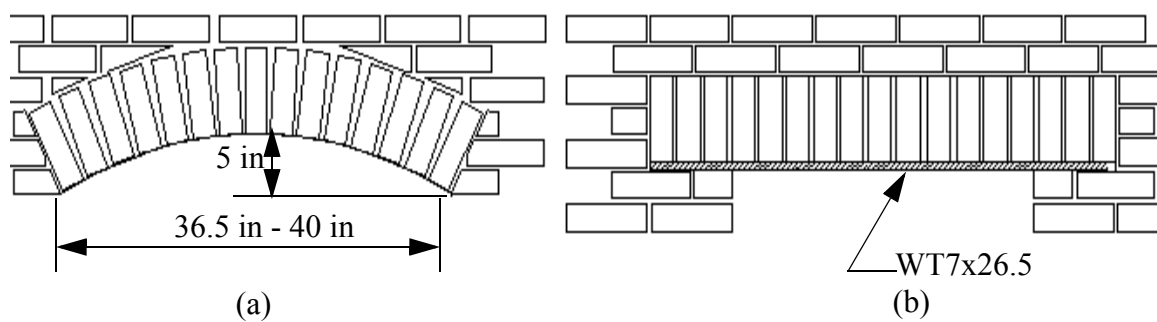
Details of (a) arch lintel and (b) steel lintel.
